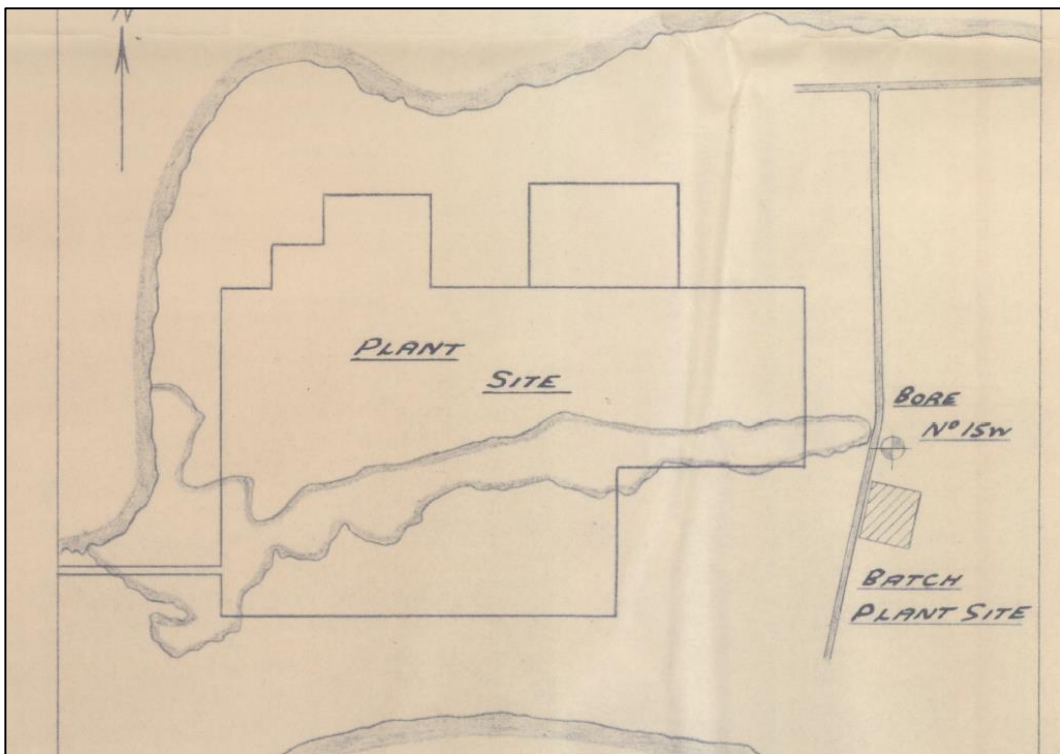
Detail of 1969 plan showing plant site on the peninsula (E. R. Garden & Partners 1969).
